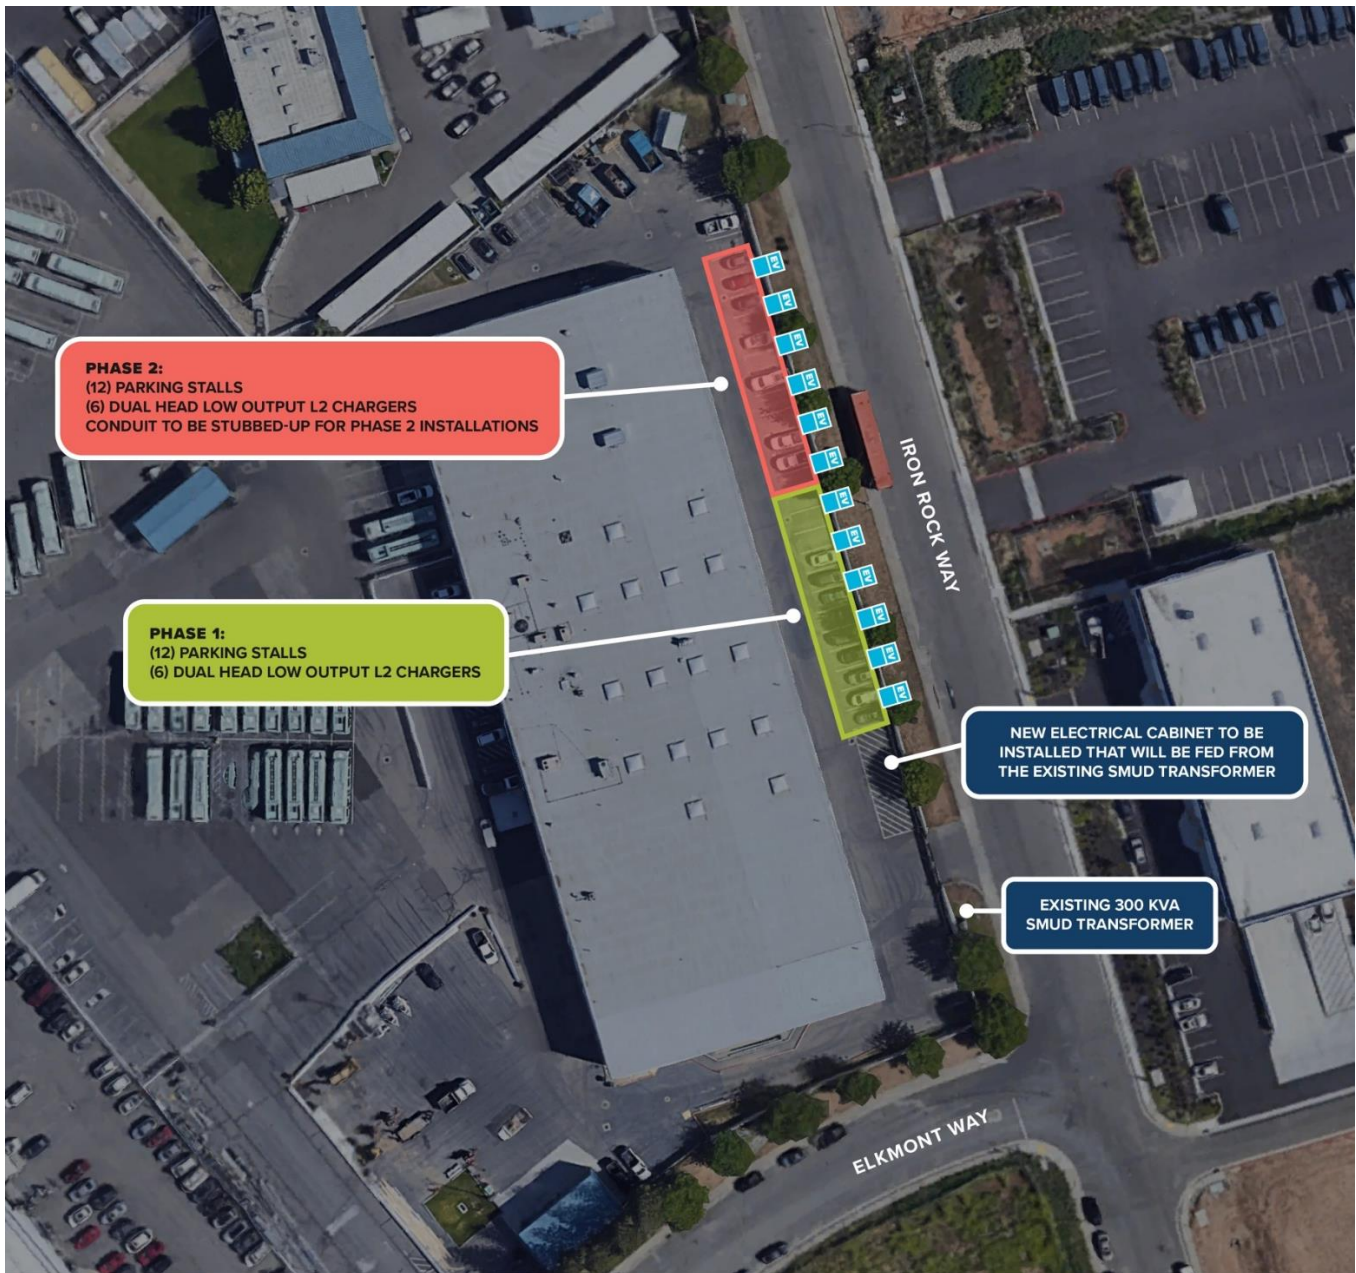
CONCEPTUAL CHARGER LAYOUT OF PUBLIC WORKS CORP YARD
